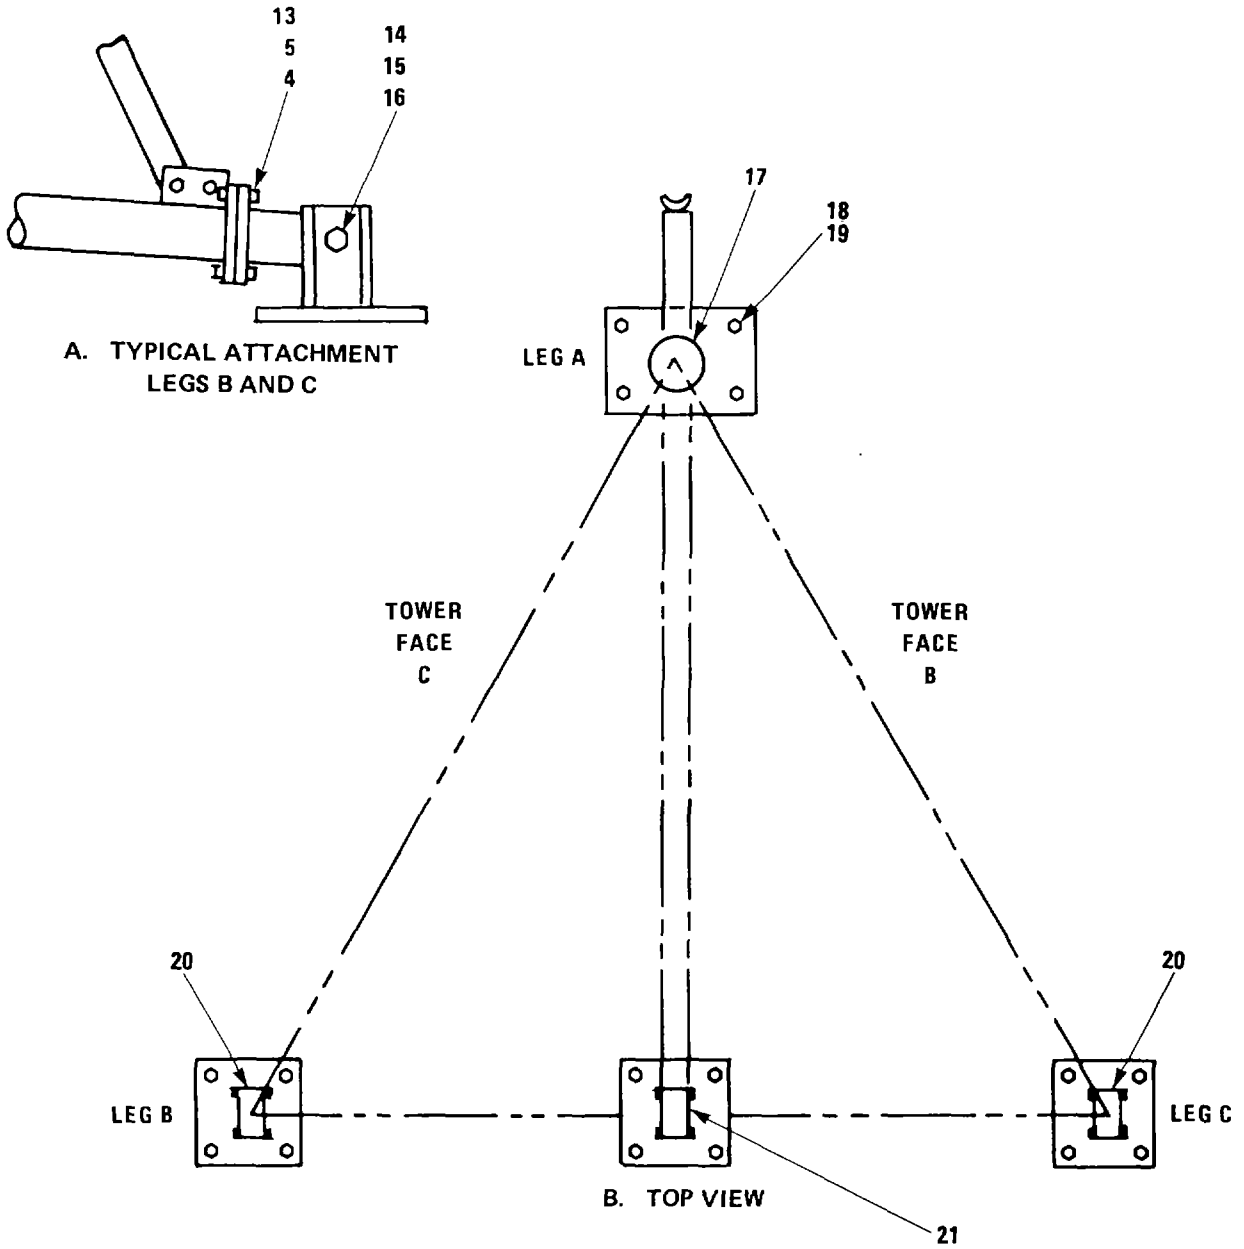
Tower Section No. 1 Installation (Sheet 2 of 2)
